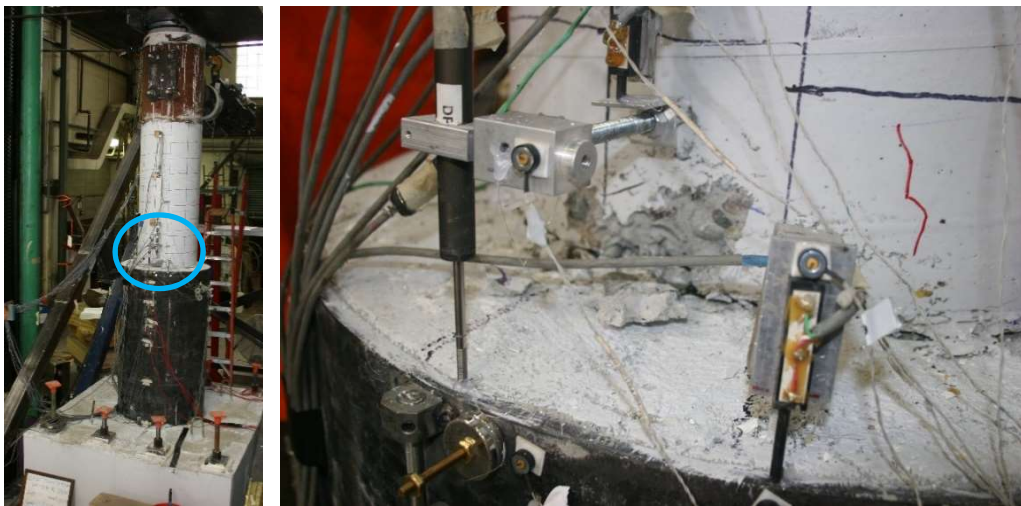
Specimen 30-21-R Spalled Region at Base of North Face of Column at 2.4% Drift
